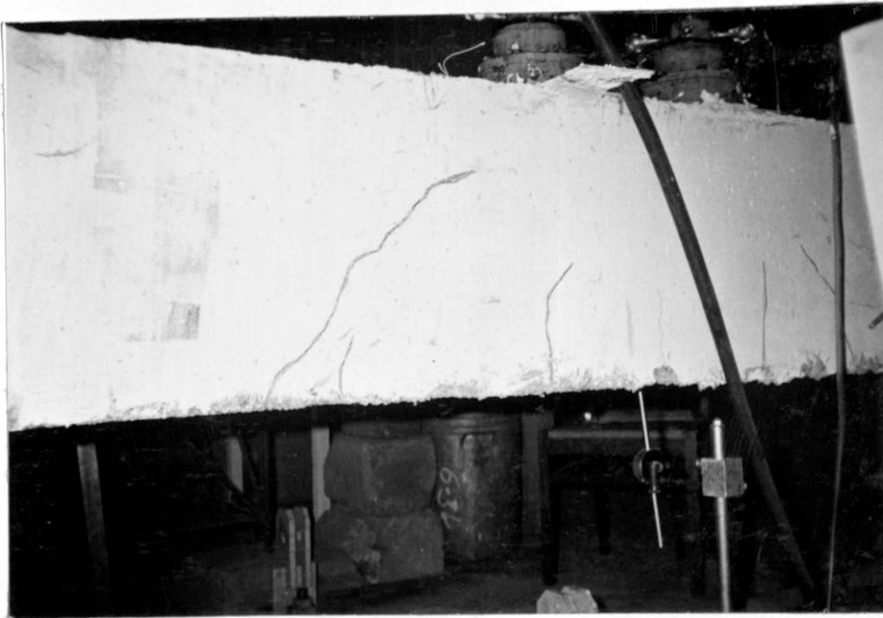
Beam CFT TB1 at about Half Capacity (rear side)
